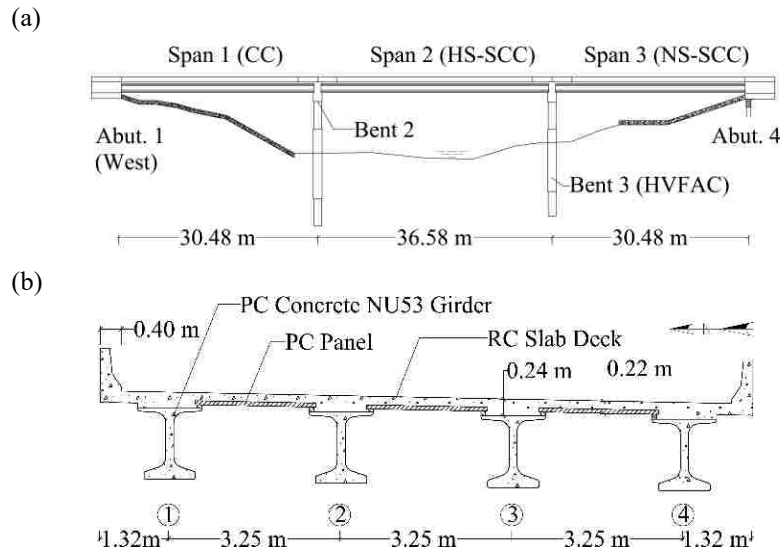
Bridge A7957: (a) elevation; (b) cross-section.
